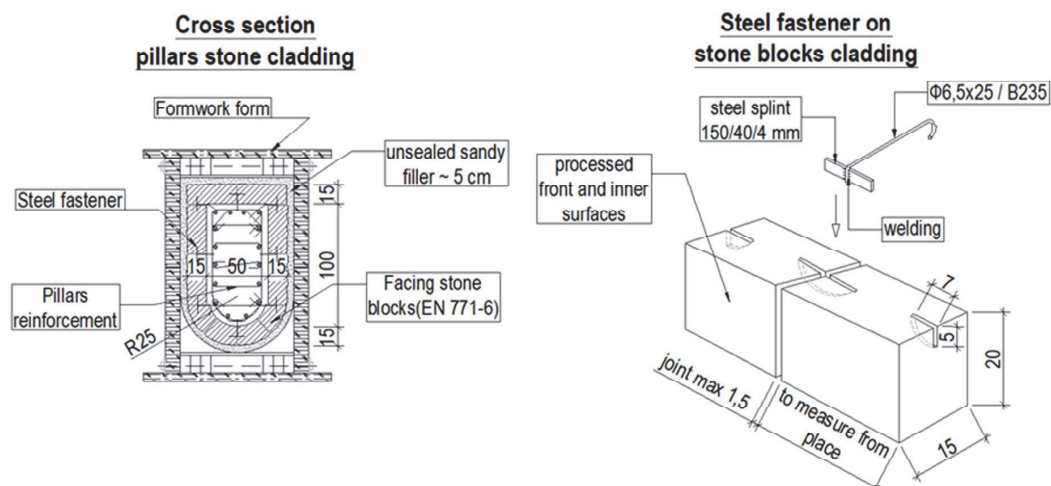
Stone cladding. Cross section with formwork and steel fastener on stone blocks
